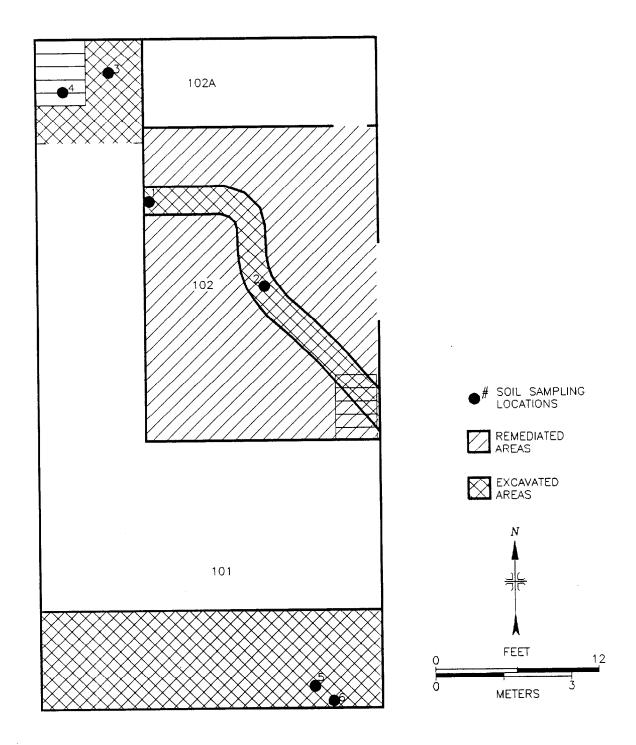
Layout of Building 27, Indicating Locations of Remedial Action
